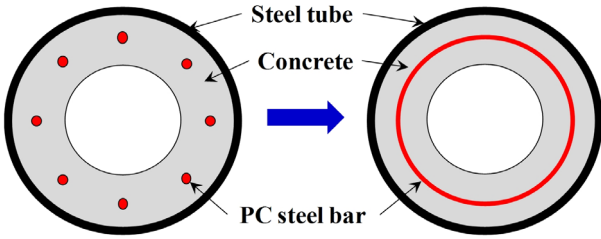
Conversion of real to virtual cross section for PC steel bars of HCFT piles
